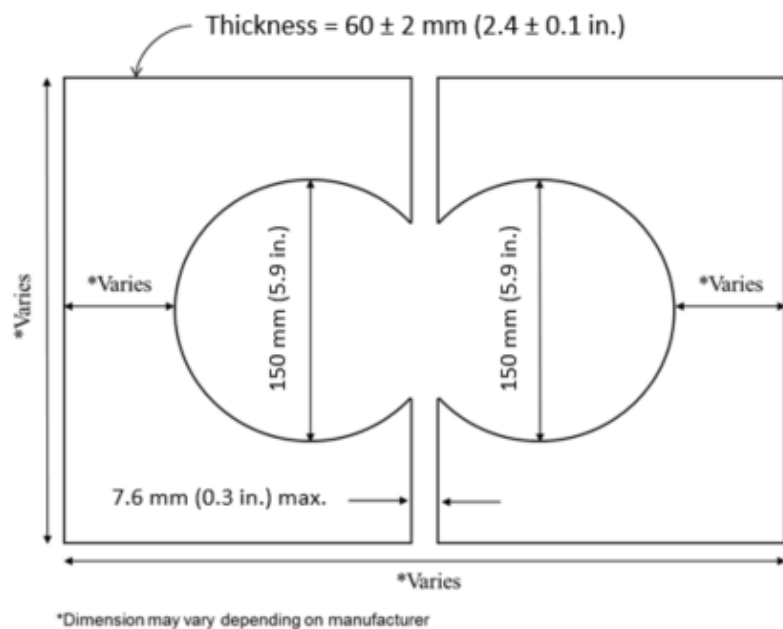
Top View of Test Specimen Configuration for the Hamburg Wheel-Tracking Device
